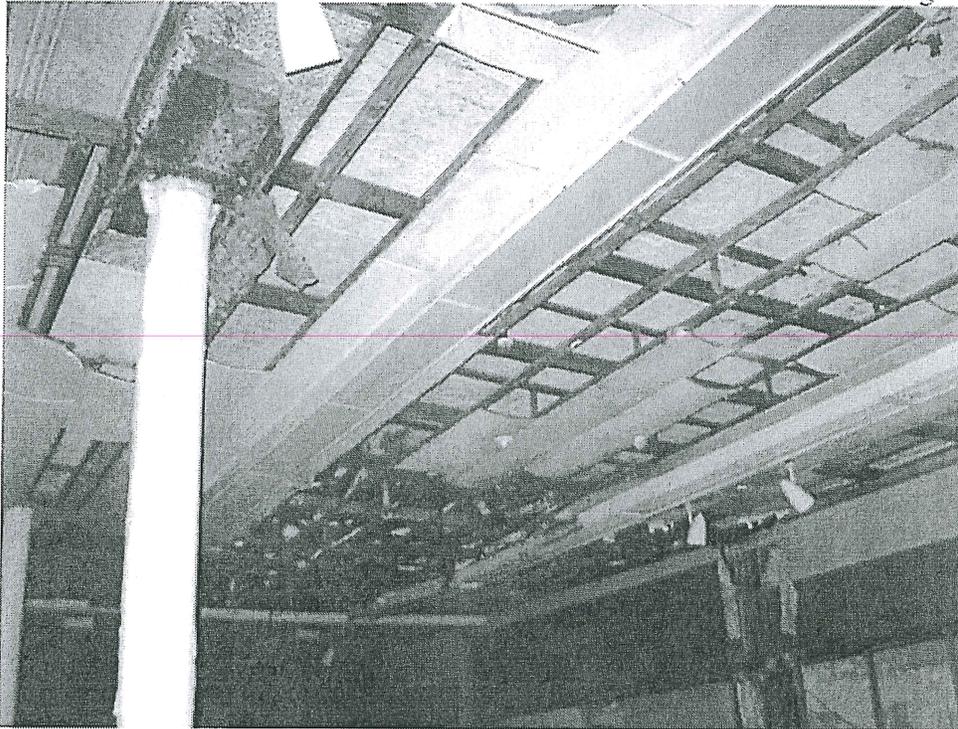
General view of the ceiling at the first floor of the Williams and Chester Bldg
